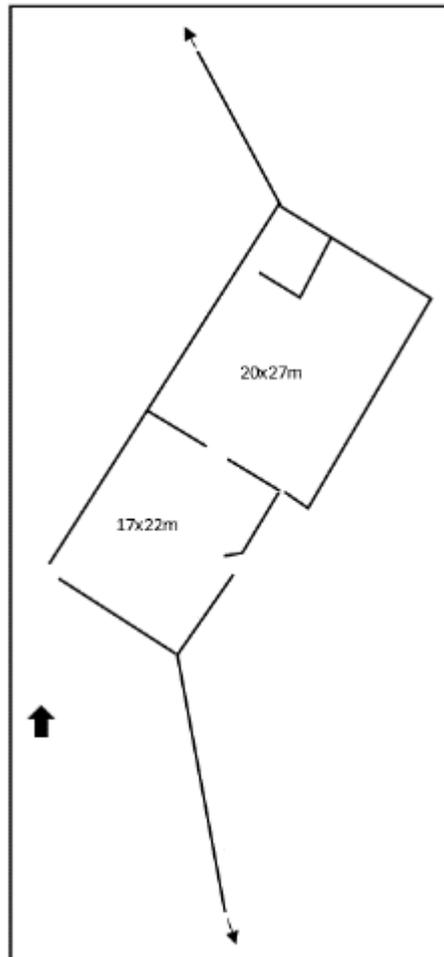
Plan of the kraal at waypoint 110 in HL02.
